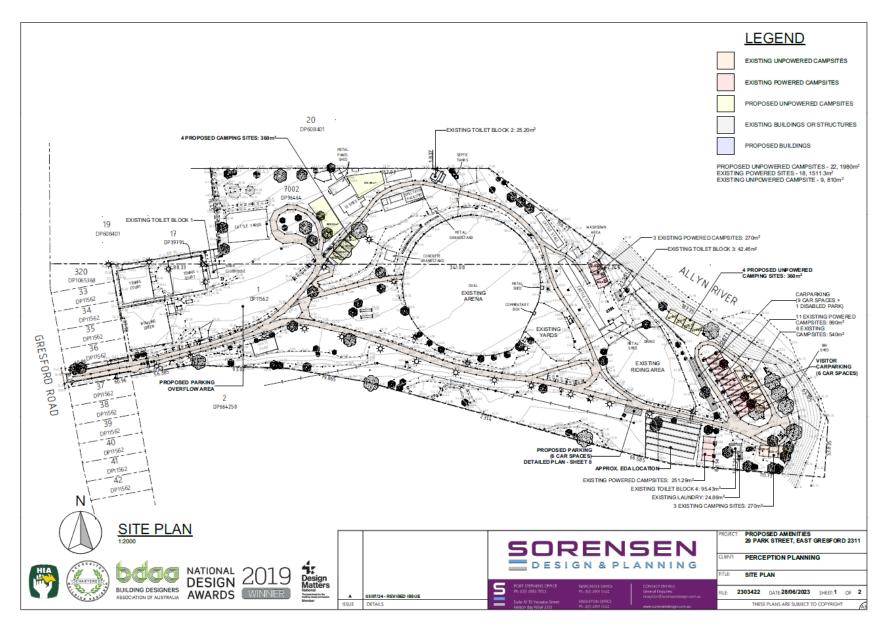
Camping Ground Plan (Source: Sorensen Design & Planning, 2024)
